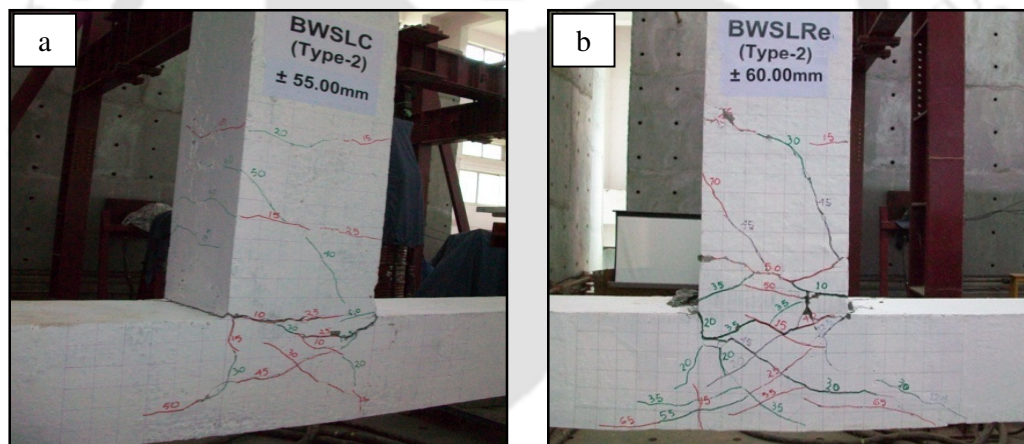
BWSL specimens at the end of test under loading type-2:
